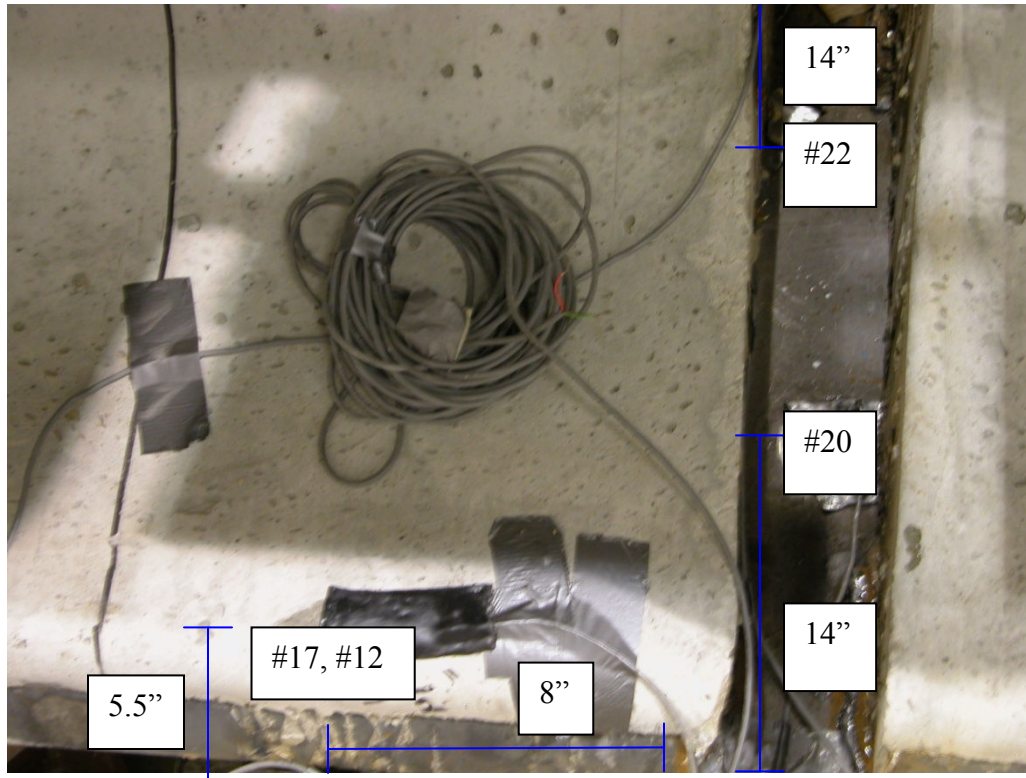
Gages in the Sole Plate and Girder Bottom Flange
